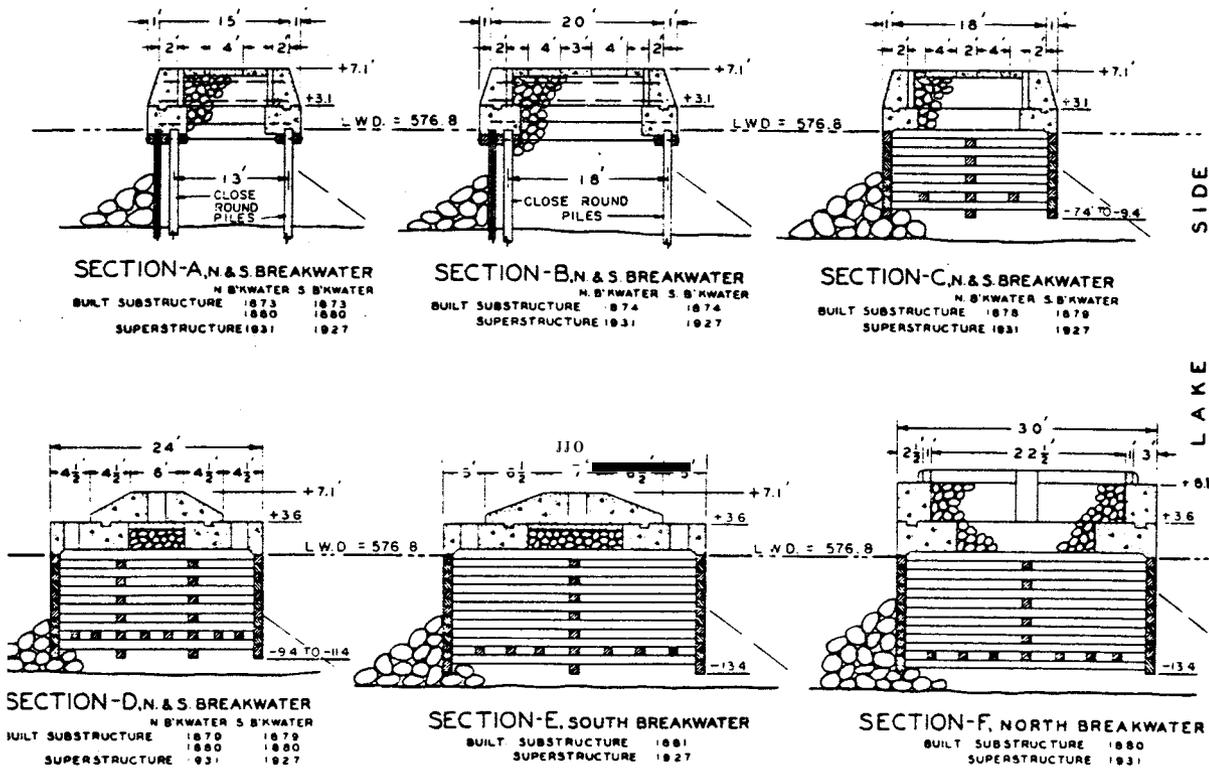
Typical breakwater cross sections, Sturgeon Bay, Wisconsin
